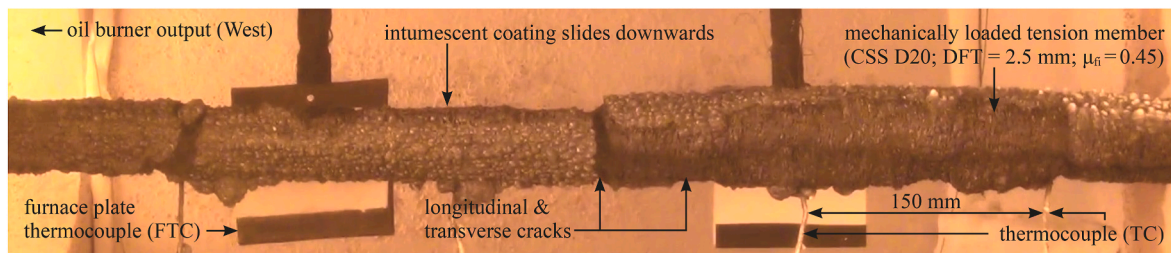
Transverse and longitudinal cracks and partial sliding of the intumescent coating at a mechanically loaded steel tension member.
